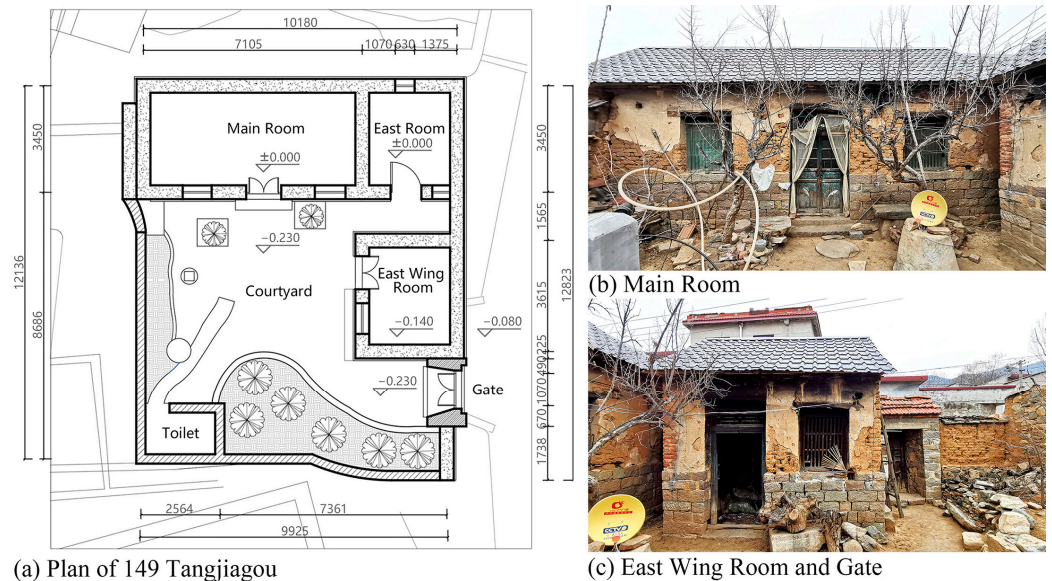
Building layout of No. 149 in Tangjiagou Village.
